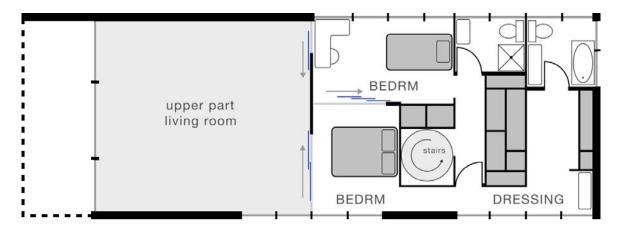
Upstairs floorplan Case Study House No.8. Drawn by thesis author based on Archdaily.com
